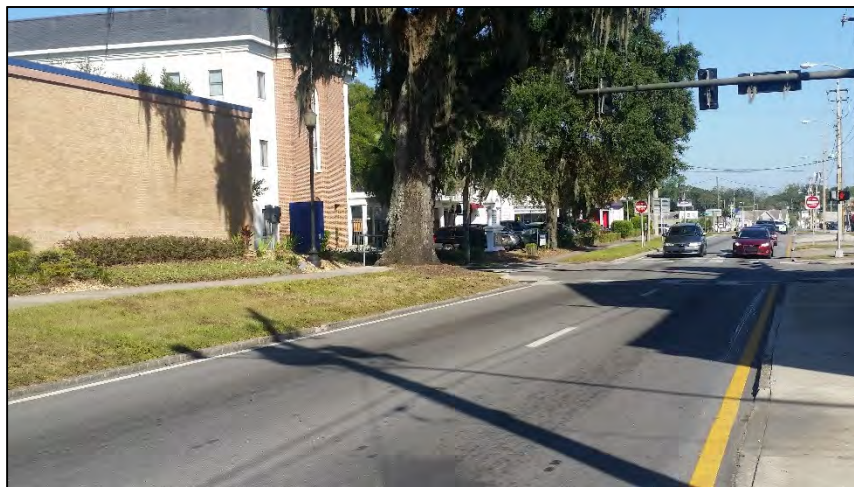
Major road with sidewalks on both sides. Source: Project Team.
